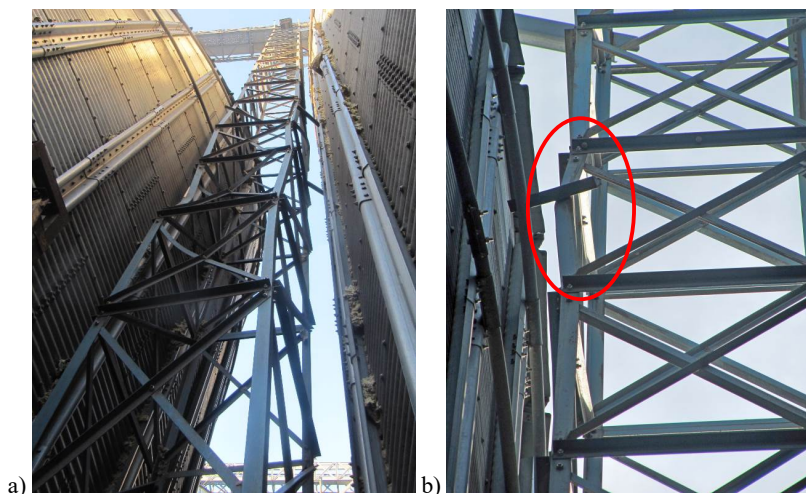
(a, b) – Loss of vertical spatial stability, horizontal sections of the transport gallery racks between silo structures
